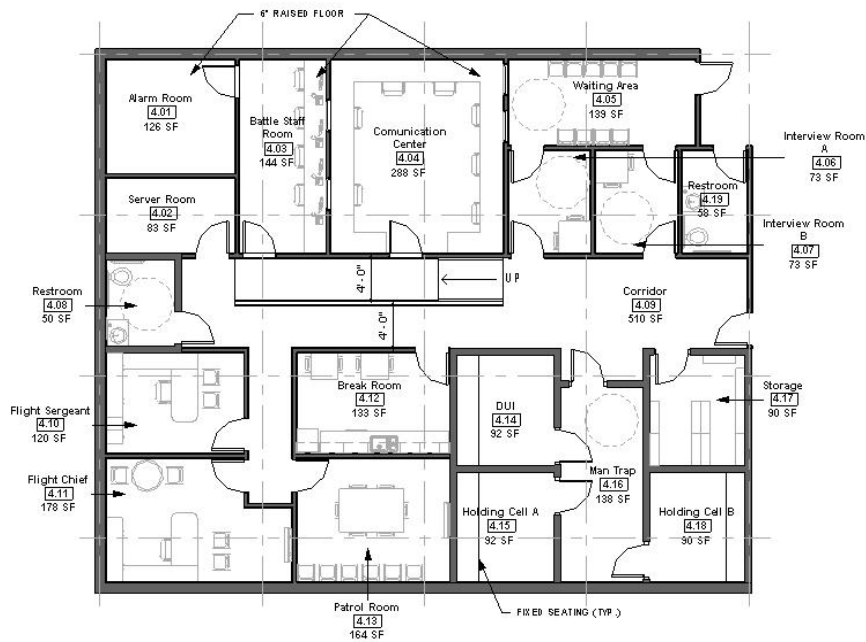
Module 4: ECC/ BDOC – Floor Plan
